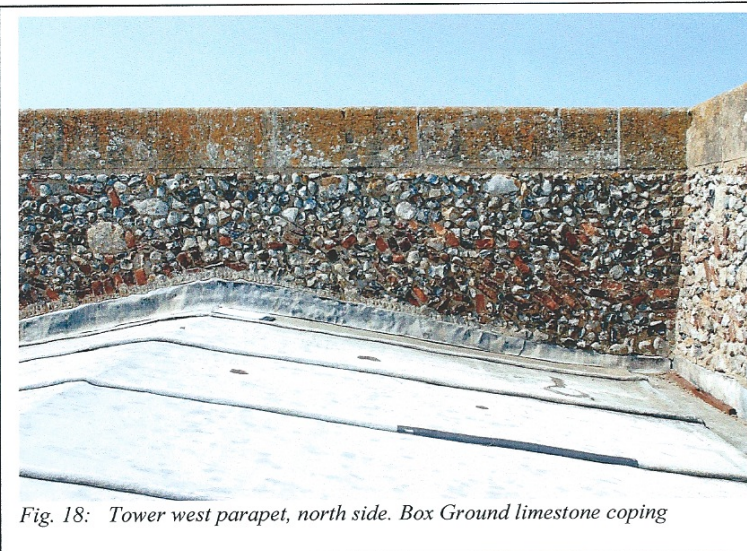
Tower west parapet, north side. Box Ground limestone coping
